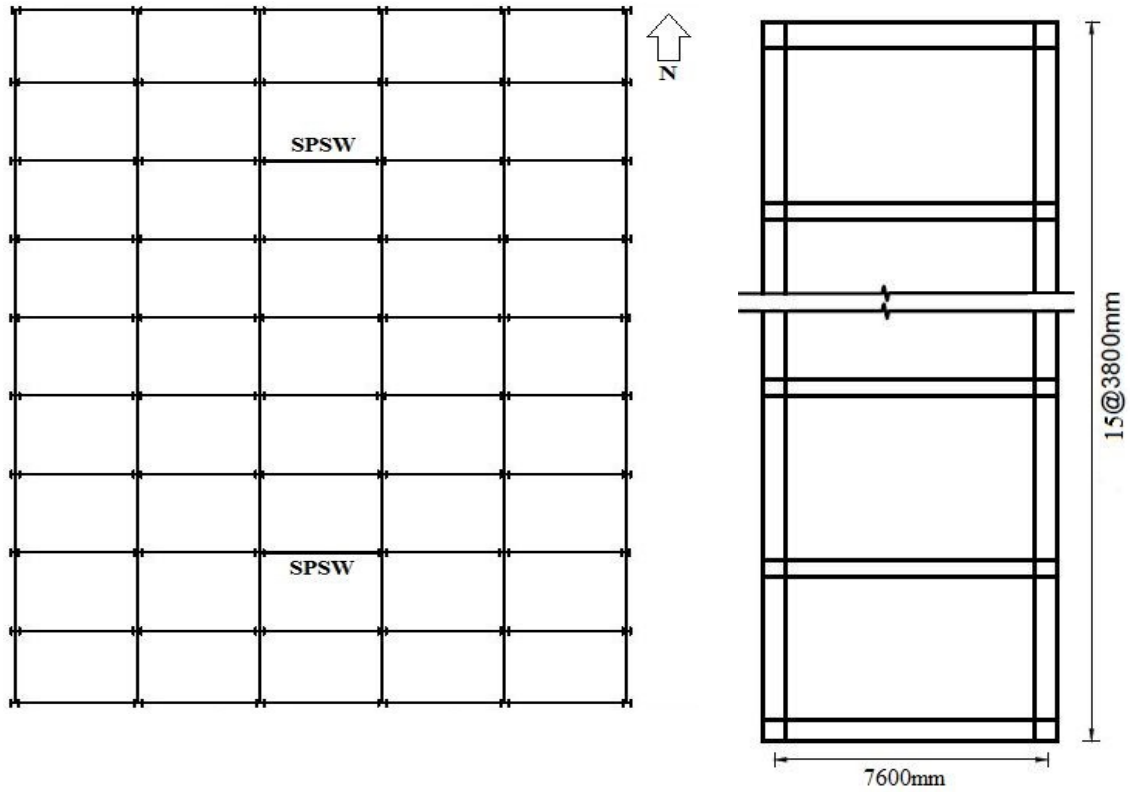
Floor plan of 15-storey building with two identical SPSW (left) and elevation view of 15-storey SPSW system (right) of Bhowmick et al. (2010).
